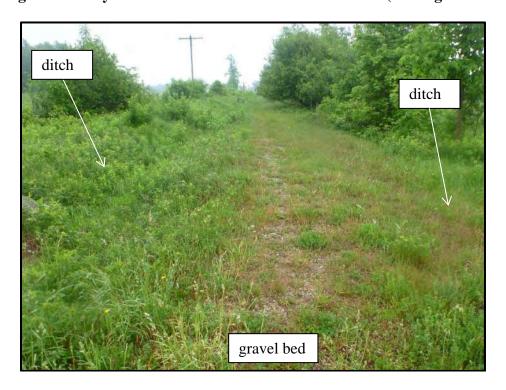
Existing Portion of John Street Through Harriston Industrial Park (looking east)
